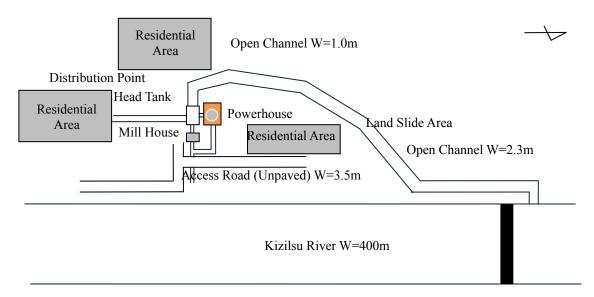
Power Facility Plan at Shibanai Site
